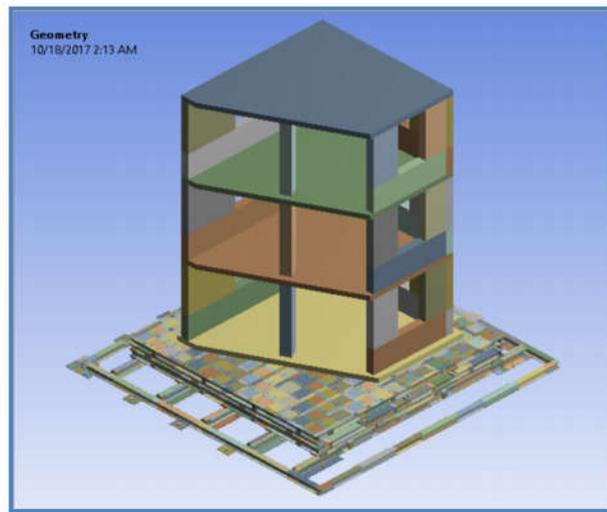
Geometry for model of three-storey shear wall RC building on shaking table
